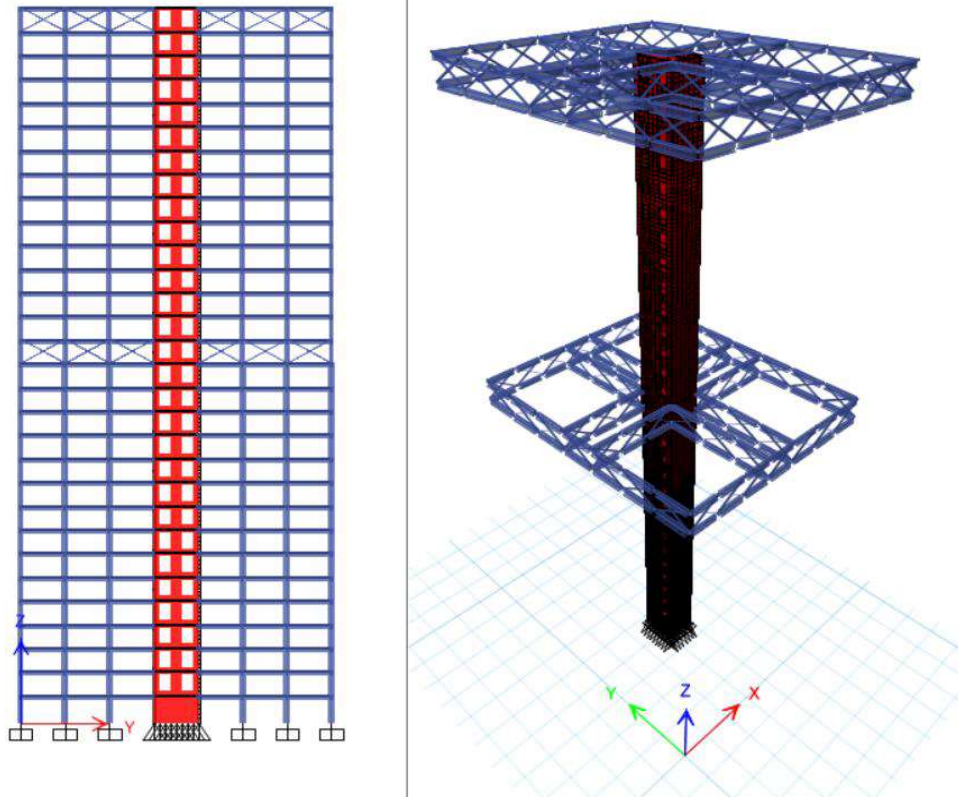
9 Structural Plan and Elevation Views of Case V Model
